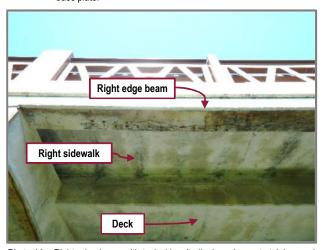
Right edge beam with typical longitudinal cracks, rust staining, and water staining (looking up and north between Floorbeams 6 and 7 in Span A). Note the transverse hairline cracks in the sidewalk underside.
